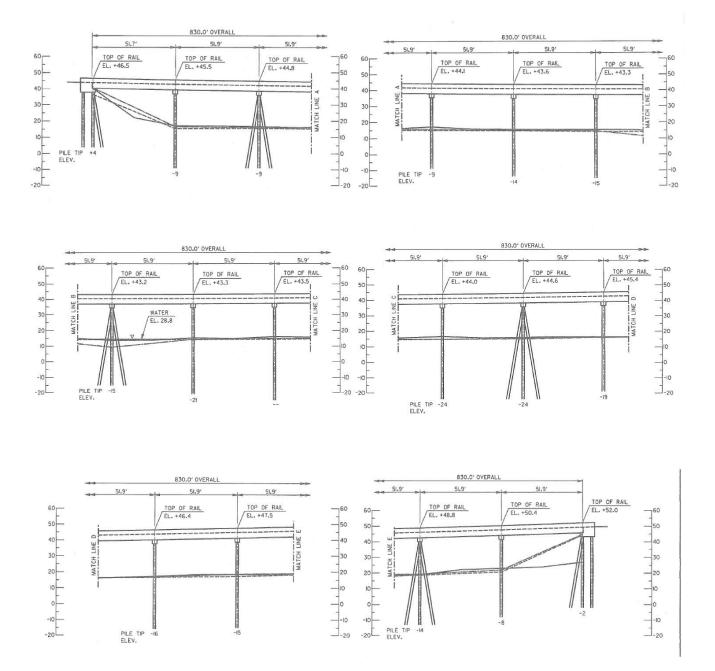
Existing Bridge 570076 over Turkey Creek
